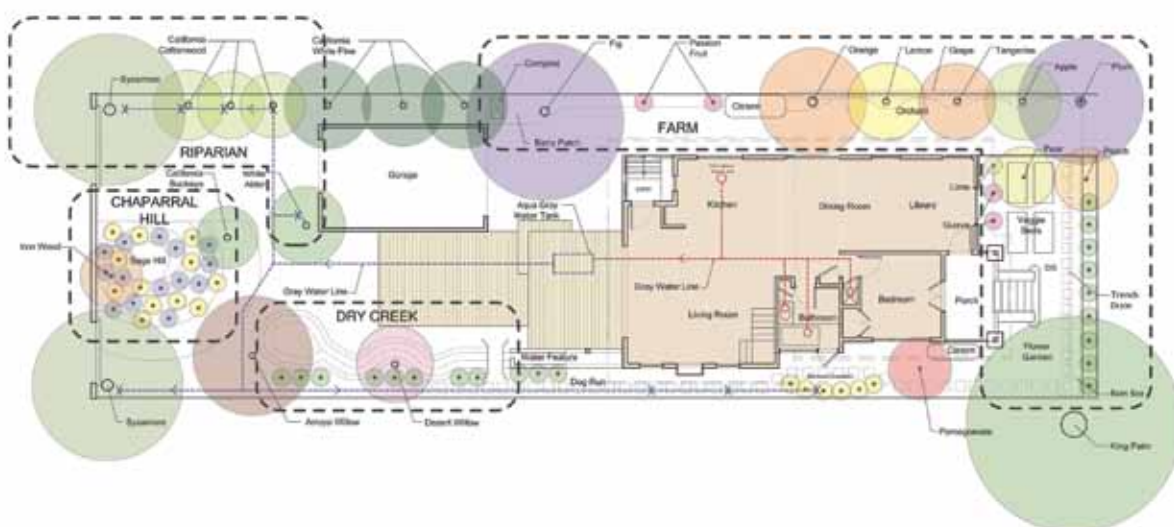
Site plan showing zoning for water use and associated plant communities' locations.
